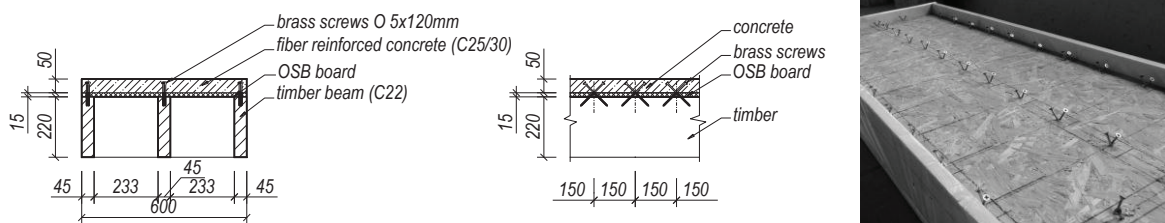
a) Cross-section and shear connection of experimental beams Type 1; b) Preparing of specimens
